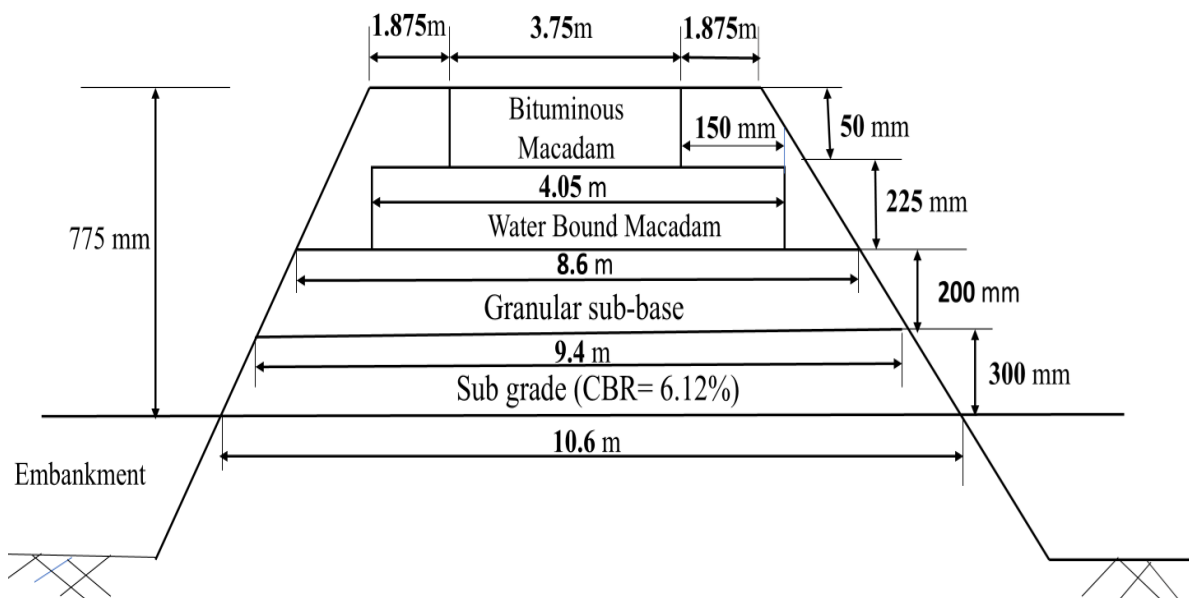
A typical cross section of pavement of Soil+1% NS+20% FA with soaked CBR.
